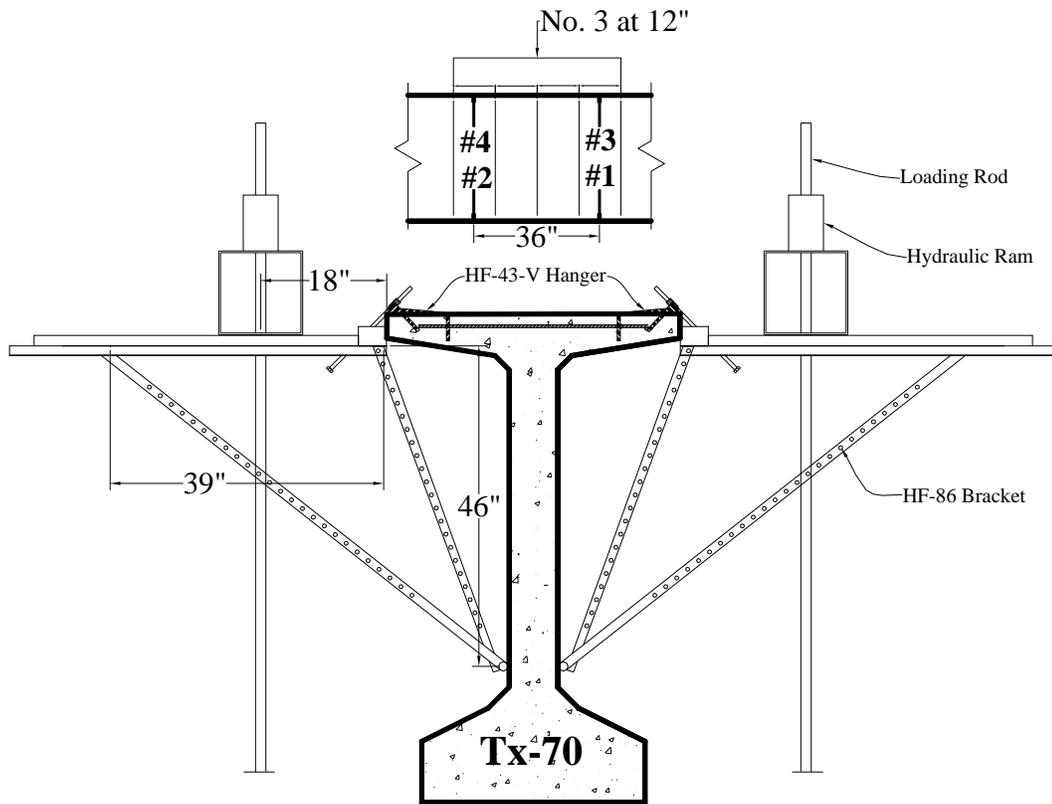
Reinforcement pattern and loading geometry for HF-43-V on Tx-70
